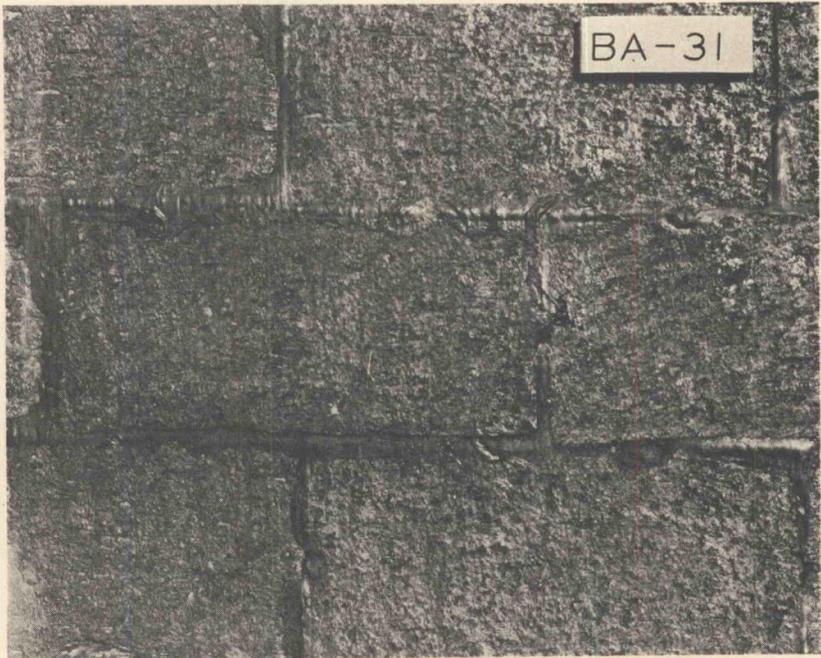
Vertical Fiber Brick Road, BA-31; April, 1934. Road Opened to Traffic in Fall of 1933.
